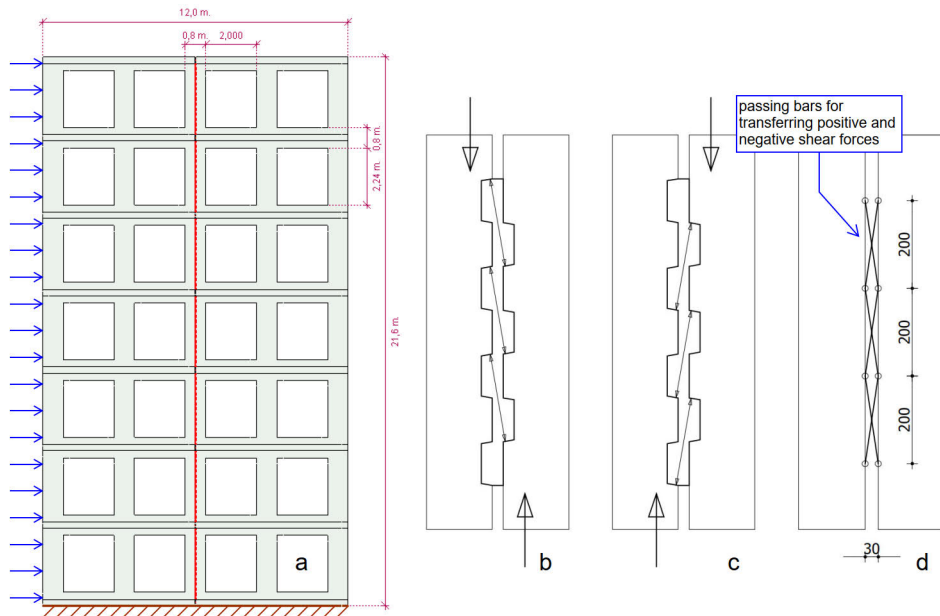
Precast concrete cantilever shear wall with openings (a) in which the Staggered shear key connection is modeled for positive as well as negative shear forces (b-d)
